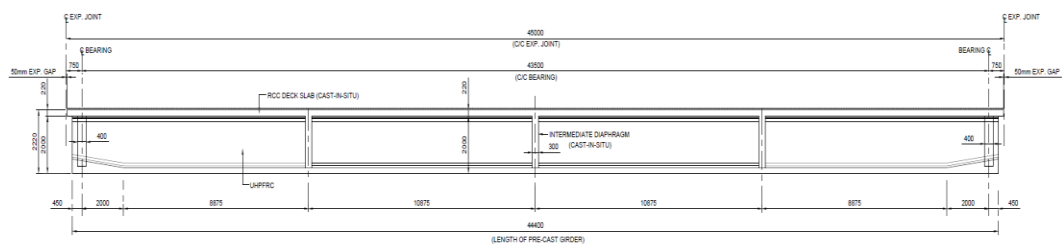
37 Elevation of 45m span UHPFRC post tensioned I girder
